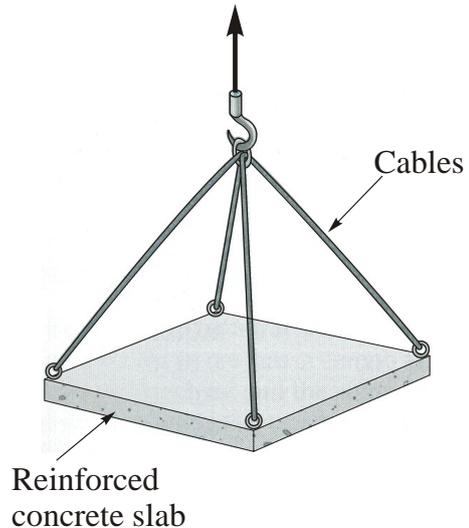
A reinforced concrete slab is lifted by 4 tensile cables
